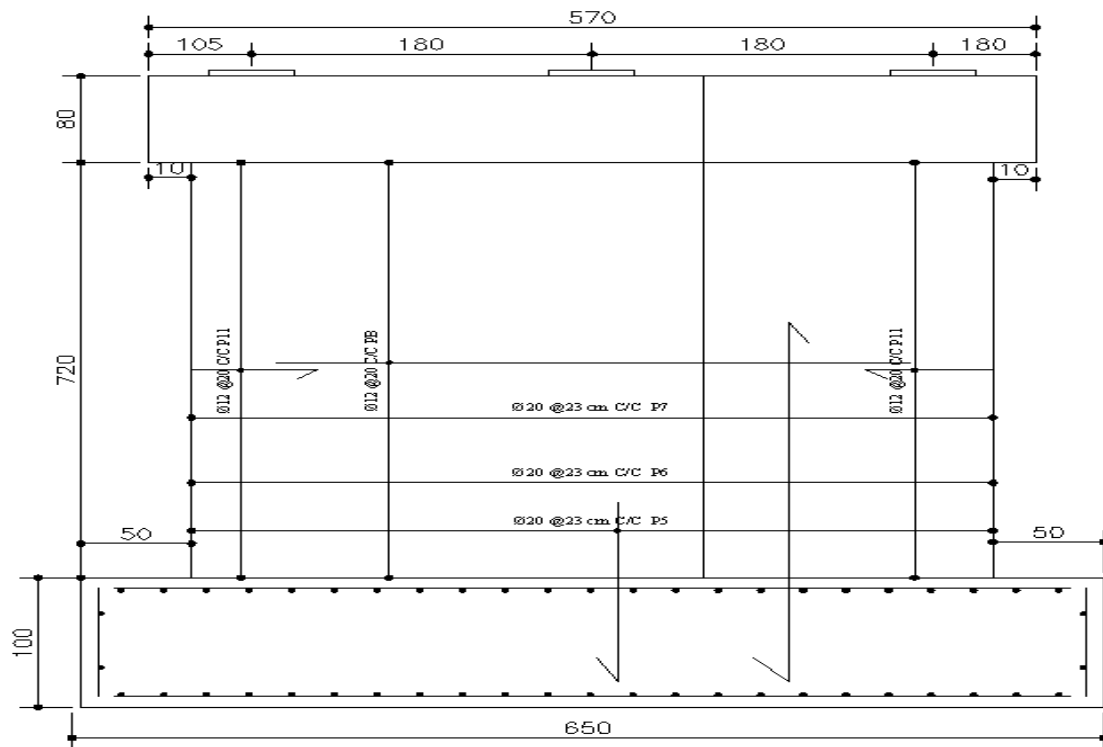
Reinforcement details in Bridge pier Before 1980 Pile
